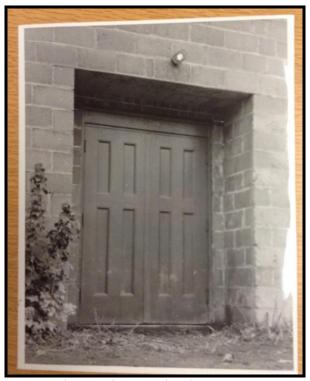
North Elevation Exit, Detail of Westernmost Door, 1947 (Archives of Ontario)
